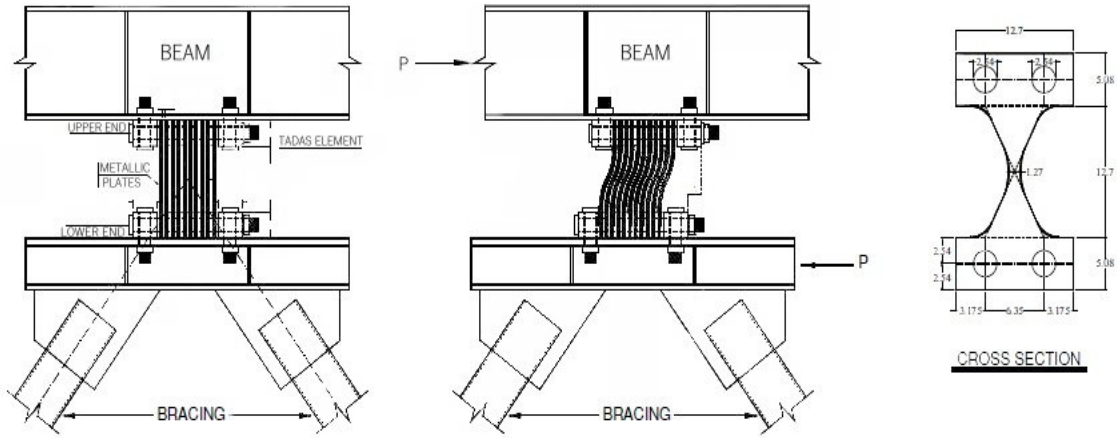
The drawing of ADAS dampers with its details(Tena-Colunga 1997)
